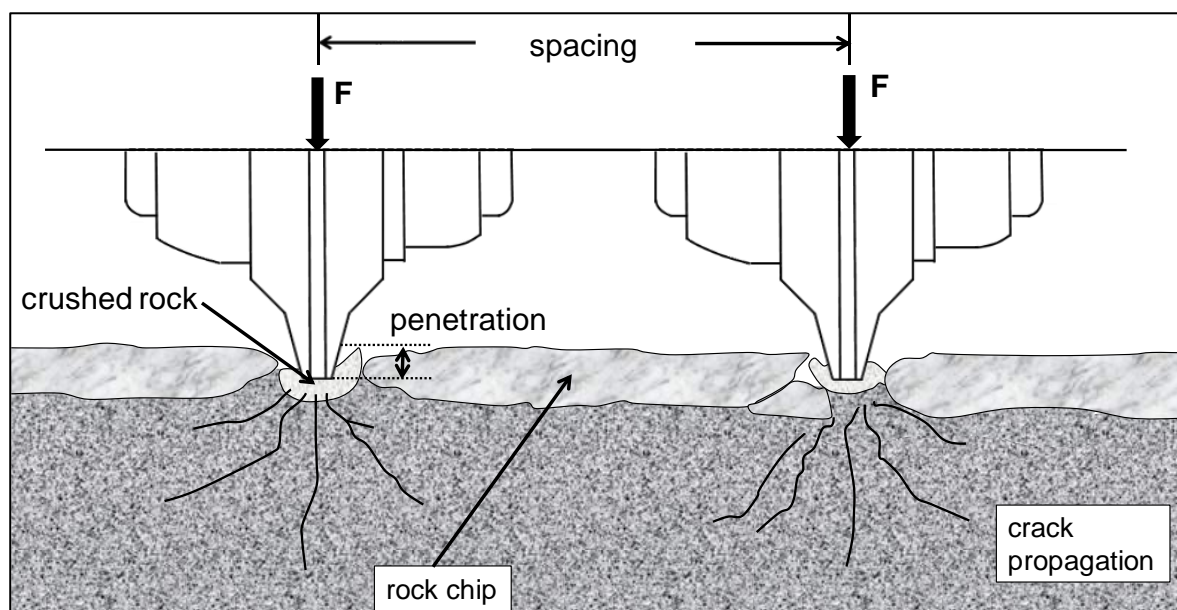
Crack propagation and rock chipping for hard rock excavation with disc cutters.
